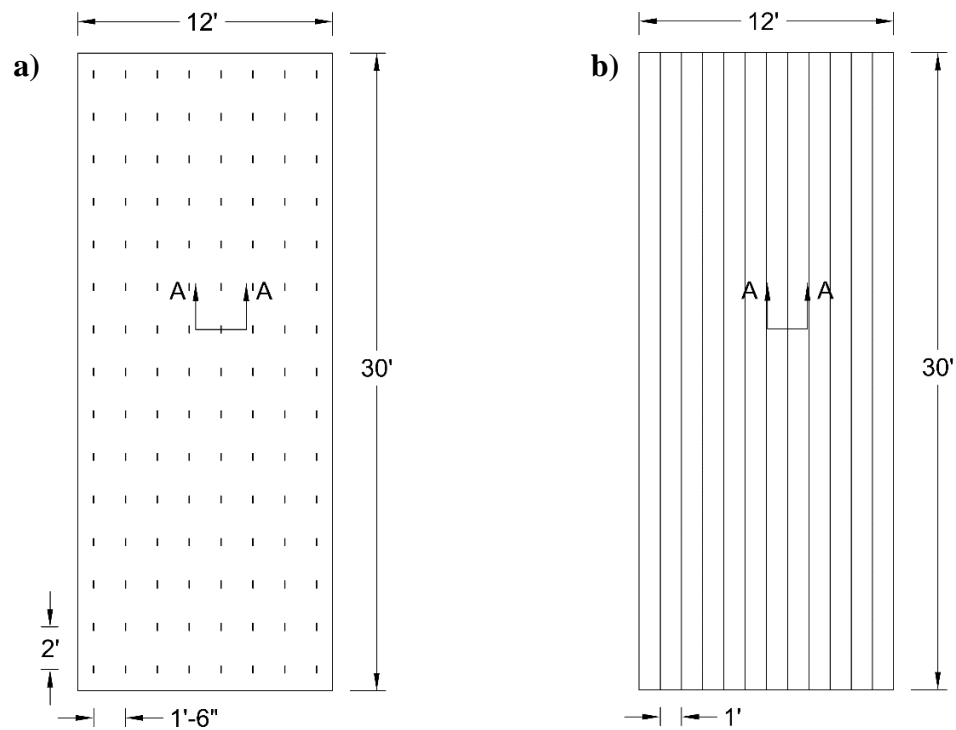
SWP layout of example analyzed with a) steel pins and b) steel truss connectors
